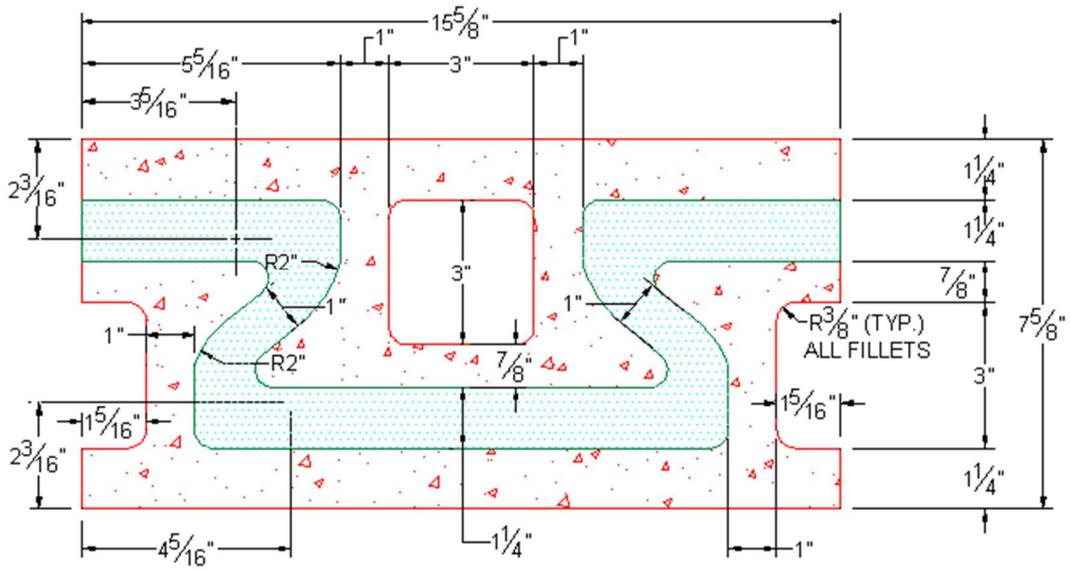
Cross Section of 8-inch NRG Concrete Masonry Unit
